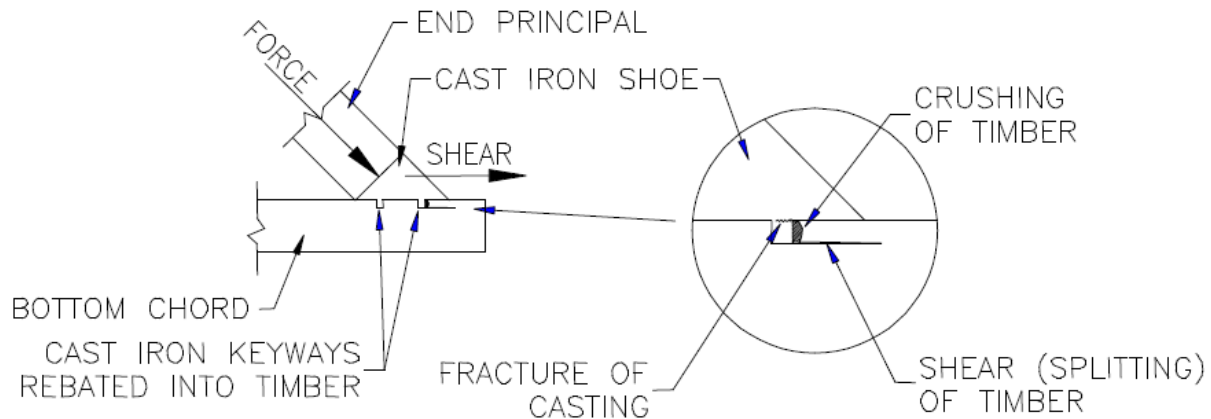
Possible Modes of Failure for Shear Key Type Connections in Timber
